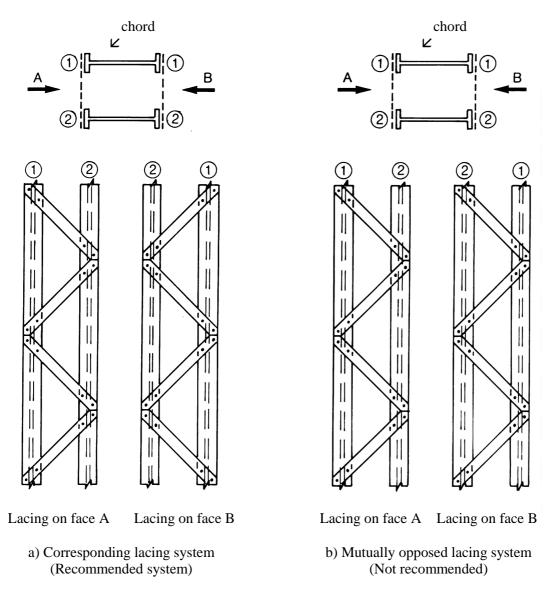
Single lacing system on opposite faces of a built-up member with two parallel laced planes
